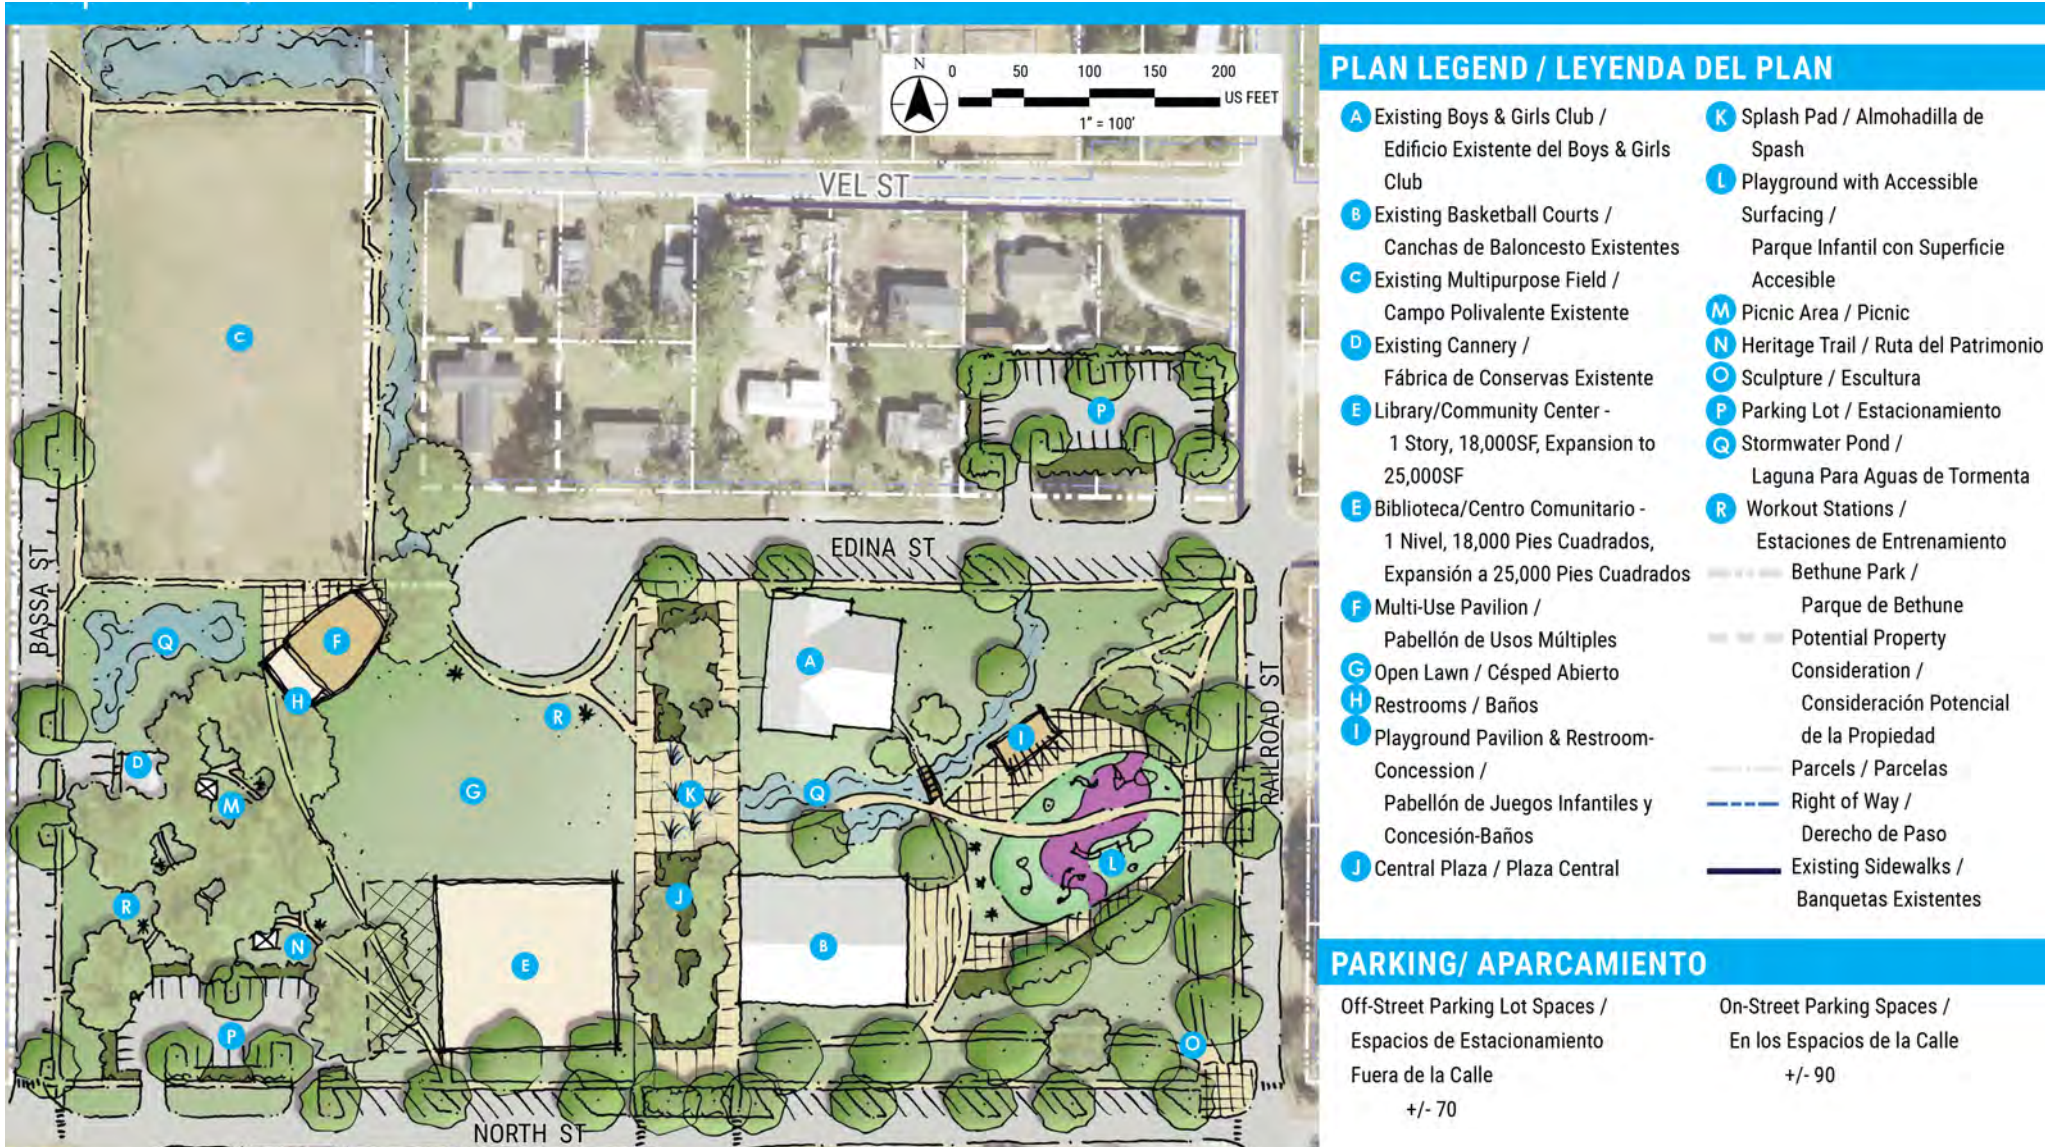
Bethune Concept Plan B Presented at Concept Workshop (9/28/24)
